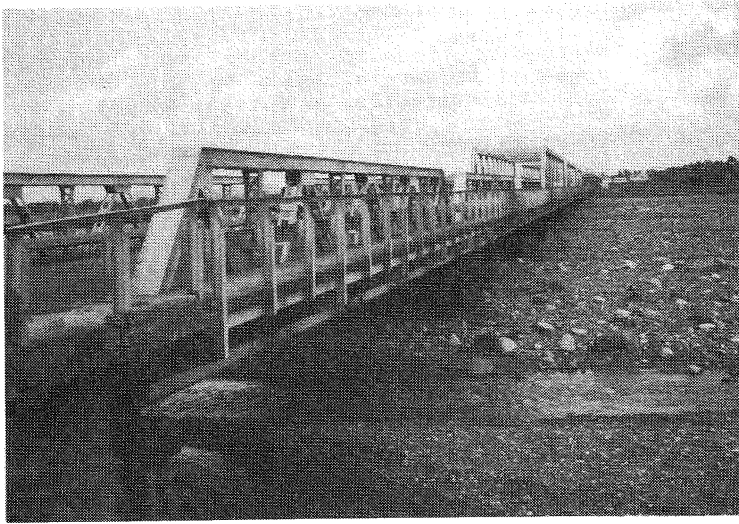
Rivetted steel Warren truss bridge with concrete deck
